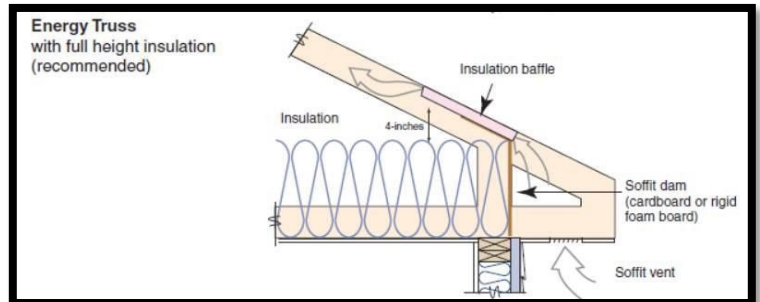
Raised heel (energy) truss with attic space. Source: [Attic Eave Minimum Insulation | Building America Solution Center \(pnnl.gov\)](#)
